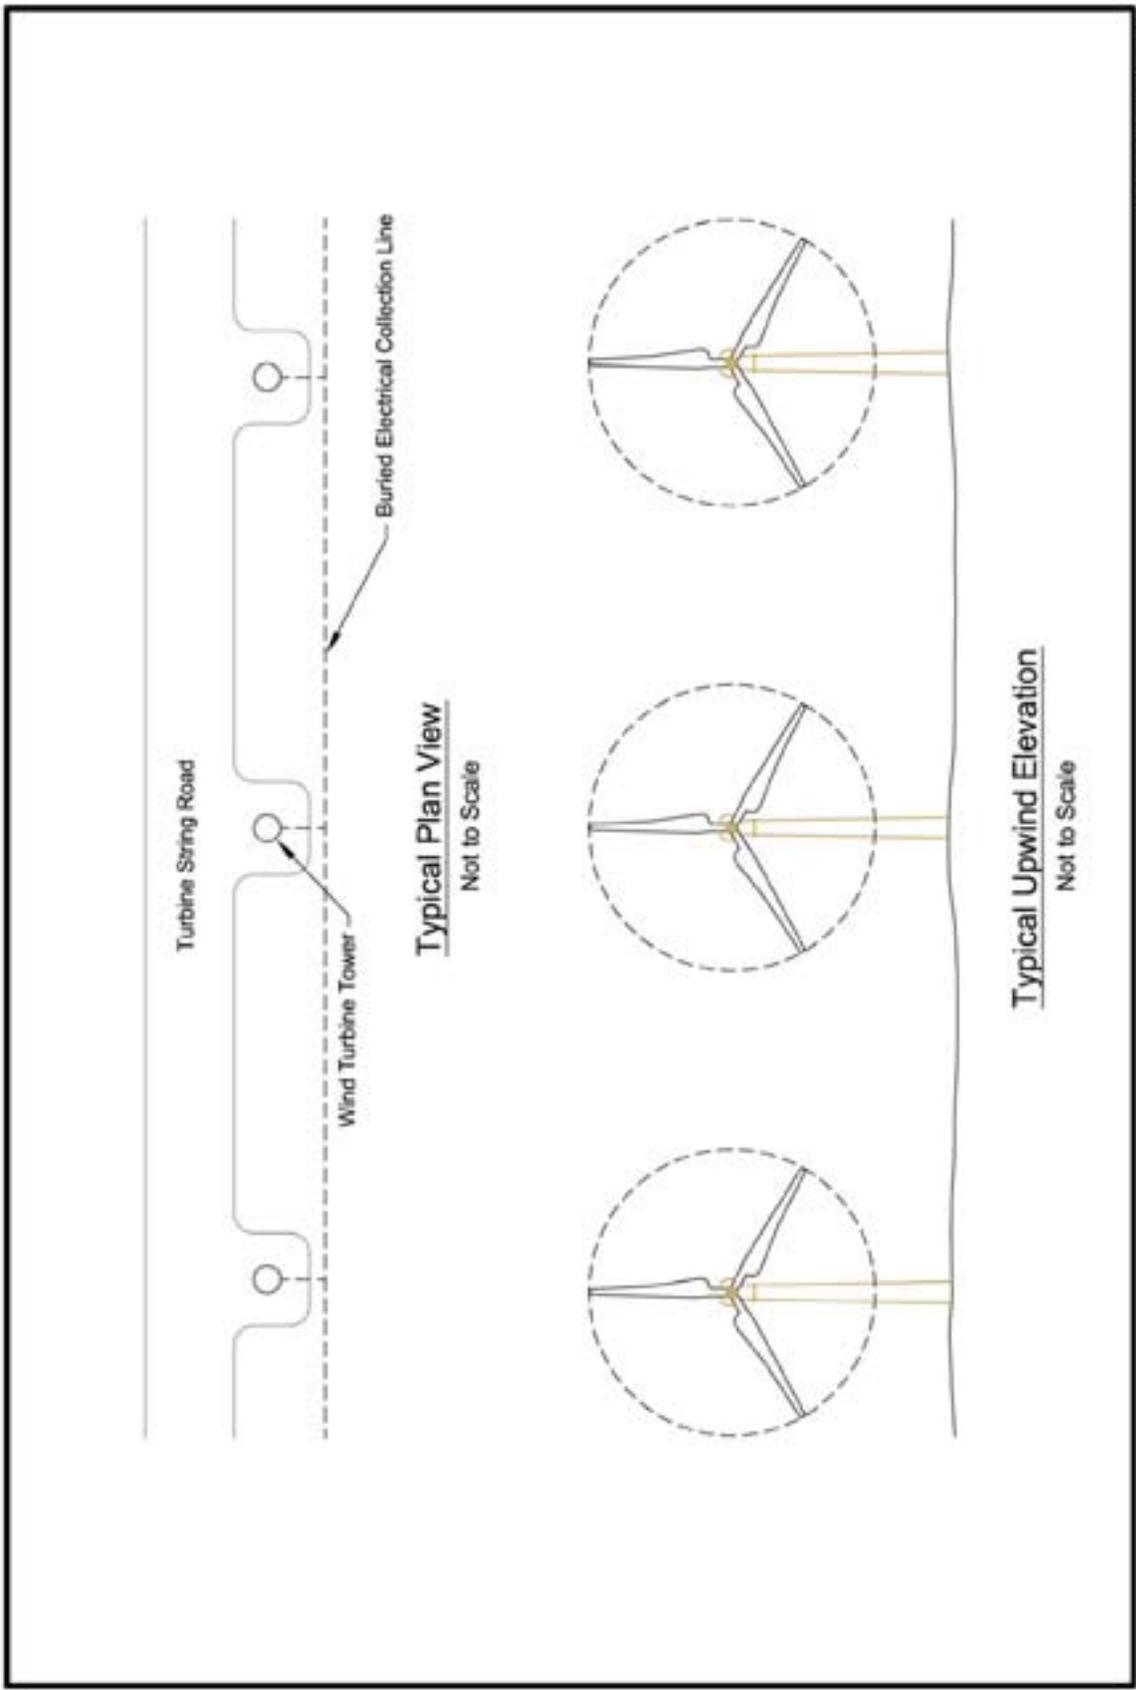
Typical Turbine String Road and Electrical Collection System Layout.
